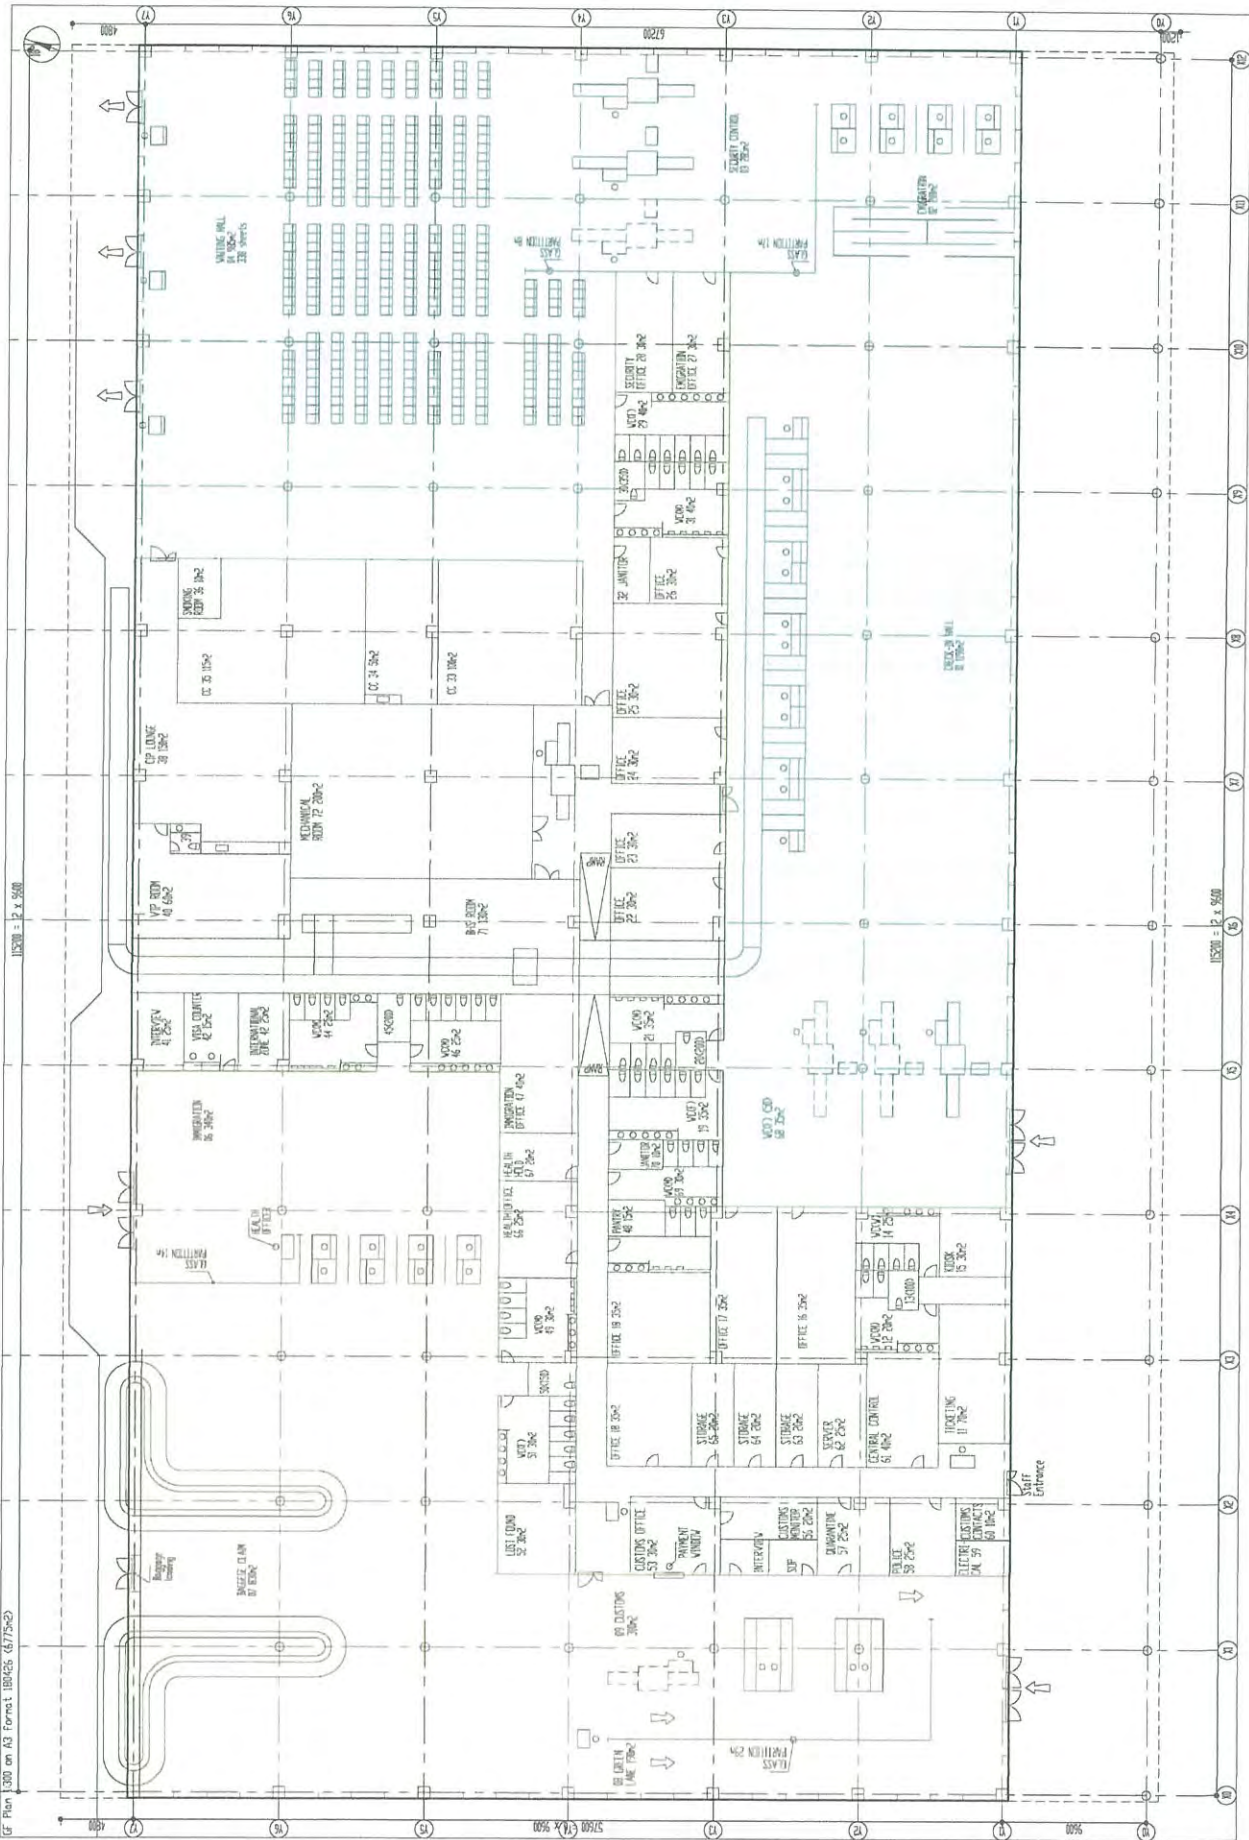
Draft Layout Plan for International Passenger Terminal Building
